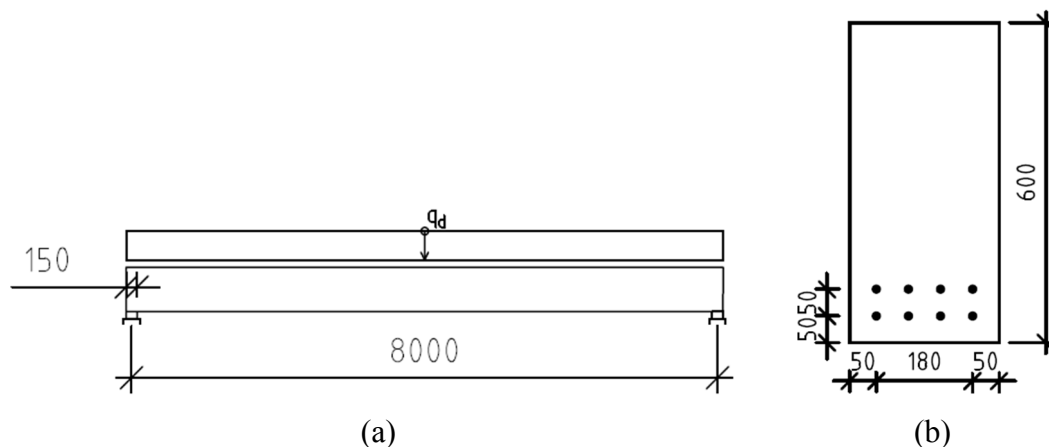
Views of the studied beam: (a) Elevation view; (b) Cross-sectional view.
